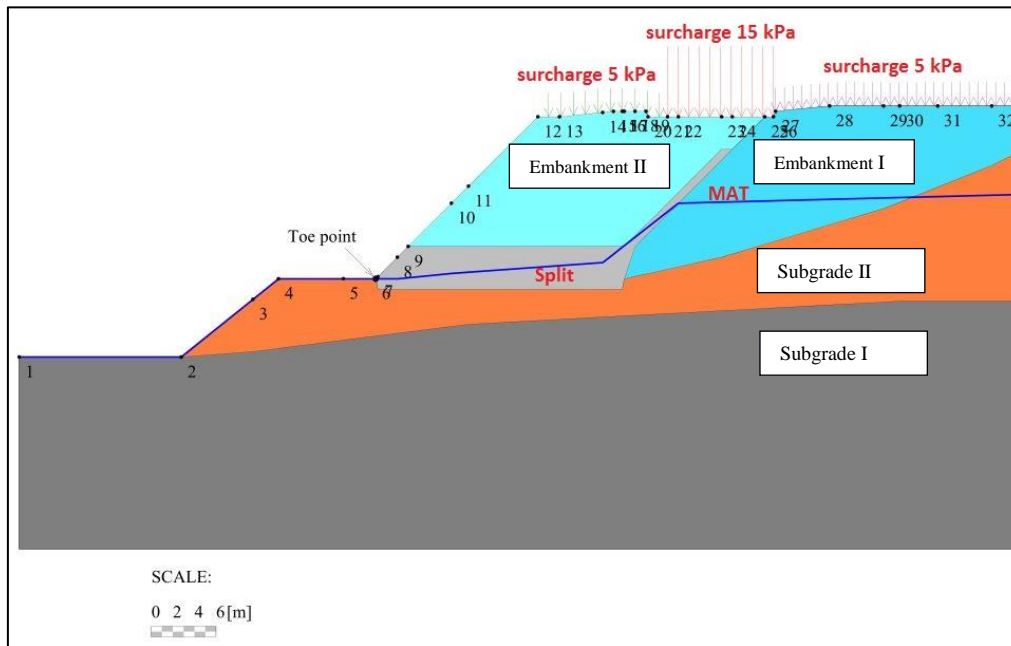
Slope Reinforcement Typical System Geometry on ReSSA (3.0)
